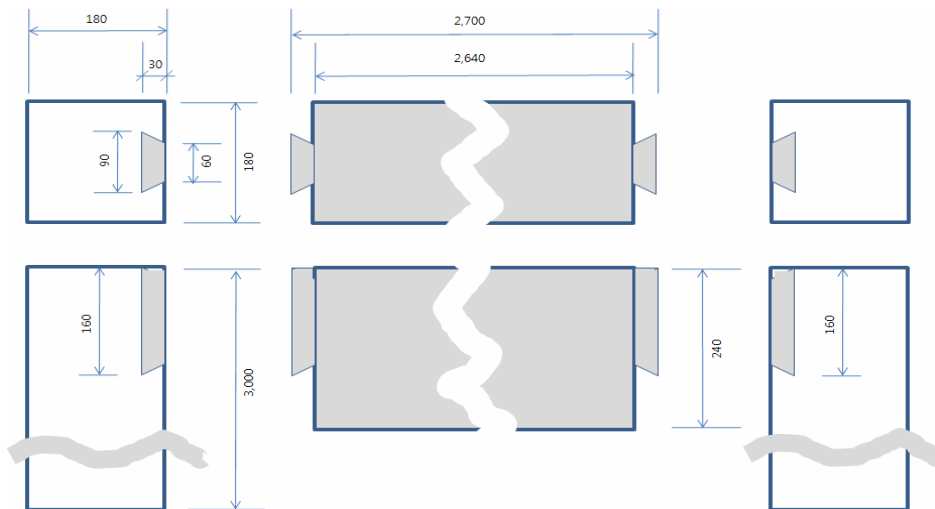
Connections between heavy timber posts and beam(unit : mm).
